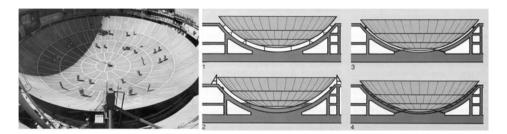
Lower embedded section of safety containment (spherical steel segment) (left), floating on and underfilling the steel shell (right) [17]
